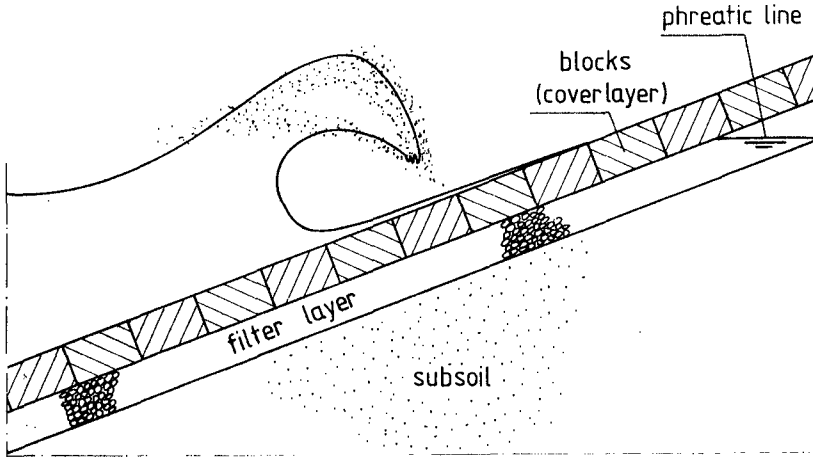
Typical cross-section of a placed block revetment with wave loading.
